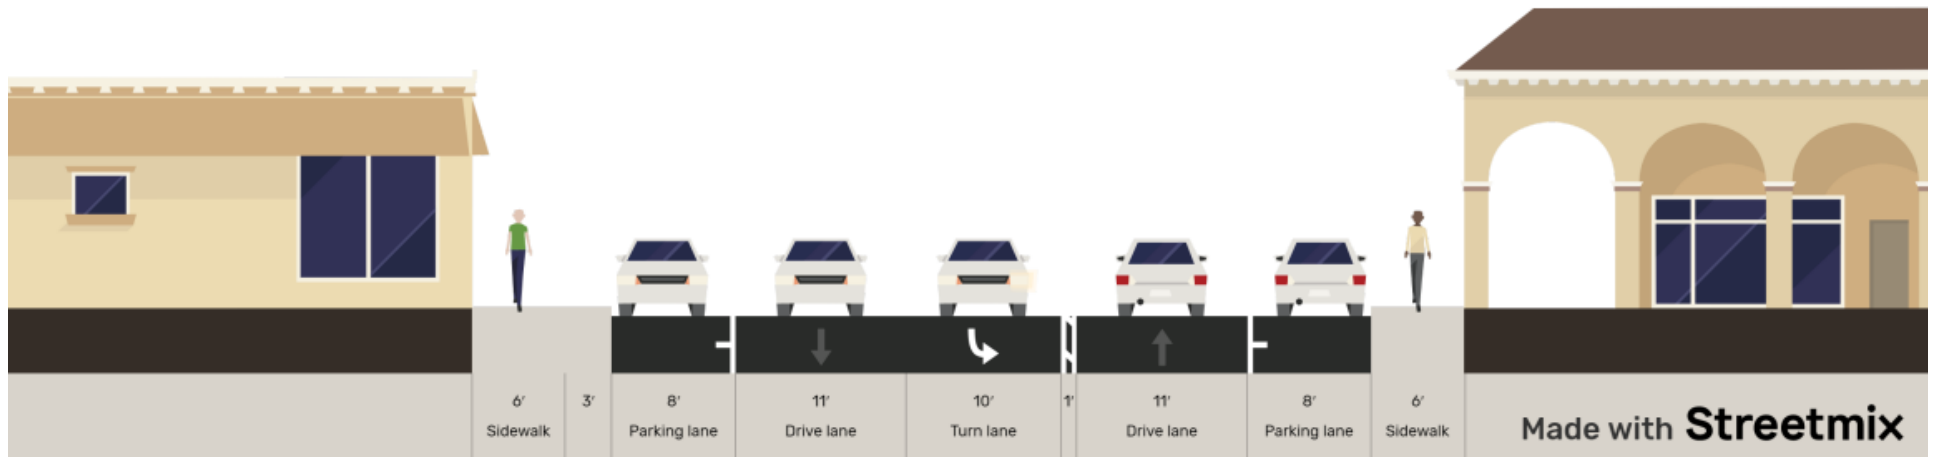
Proposed Broadway Street Road Diet & Bike Path Layouts: San Antonio to Franciscan Way
